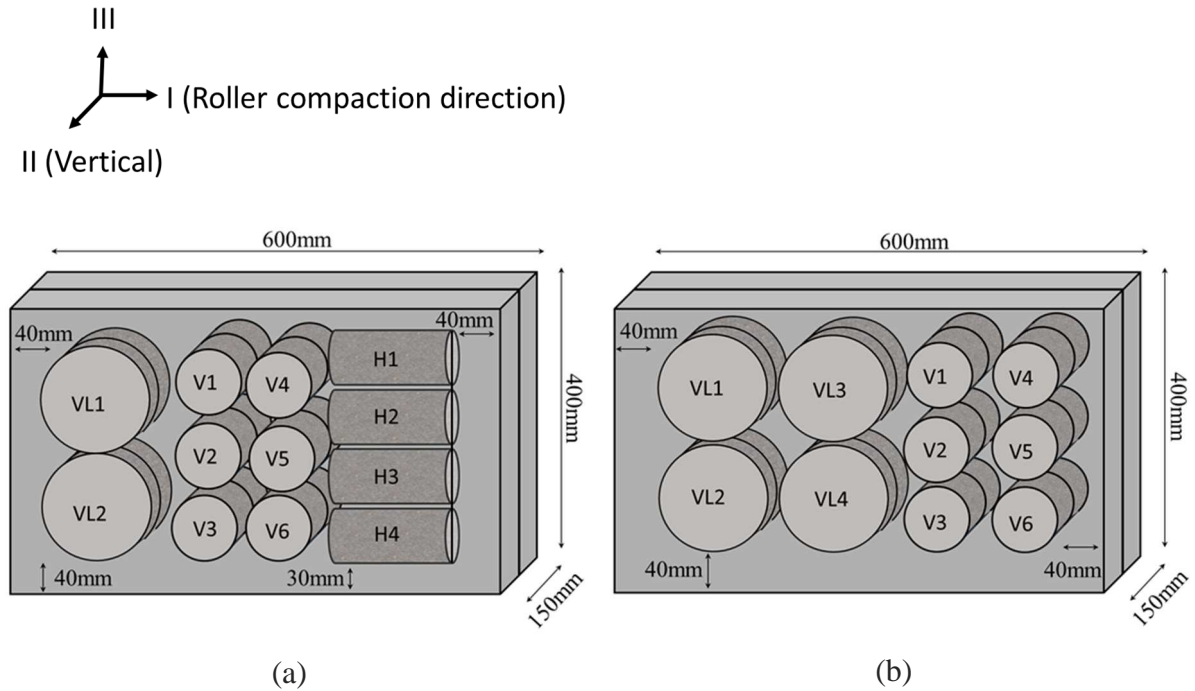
Additional coring plan for slabs C to allow obtaining specimens with larger diameters (136mm): (a) Plan 1b, and (b) Plan 4
